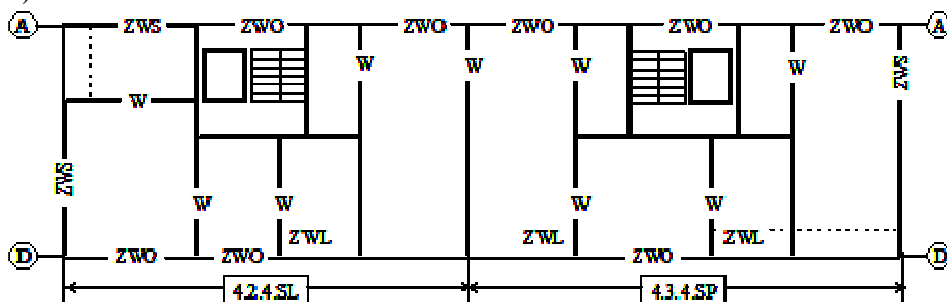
Example of construction plan of an 11-storey precast concrete large-panel building
